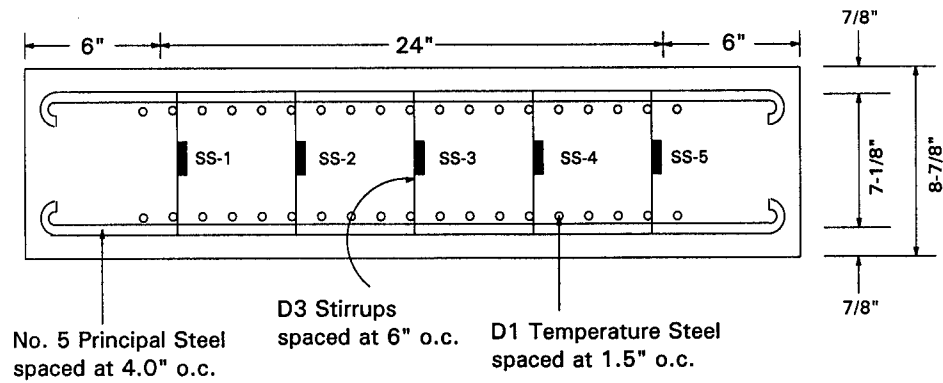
Strain Gage Locations on Stirrups in Slab No. 10
